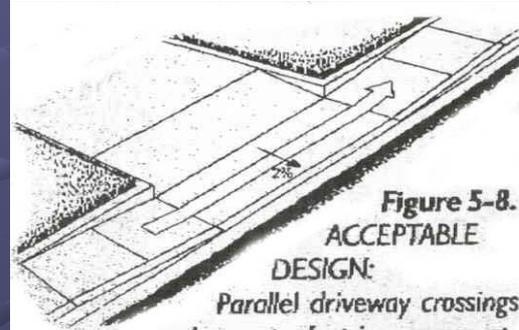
ACCEPTABLE DESIGN: Parallel driveway crossings enhance pedestrian access at a driveway crossing when there is no room to provide a level landing. Parallel driveway crossings are not as desirable as other accessible driveway crossings because users are forced to negotiate two ramps instead of a level surface.
